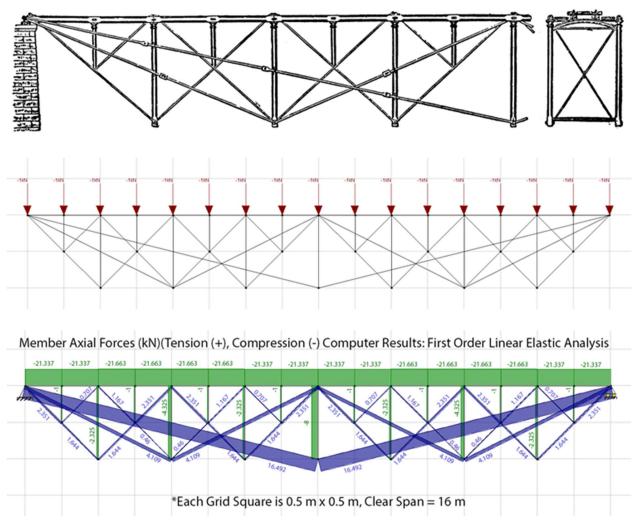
Force distribution in one of the old Truss Bridge Design, Fink Truss
